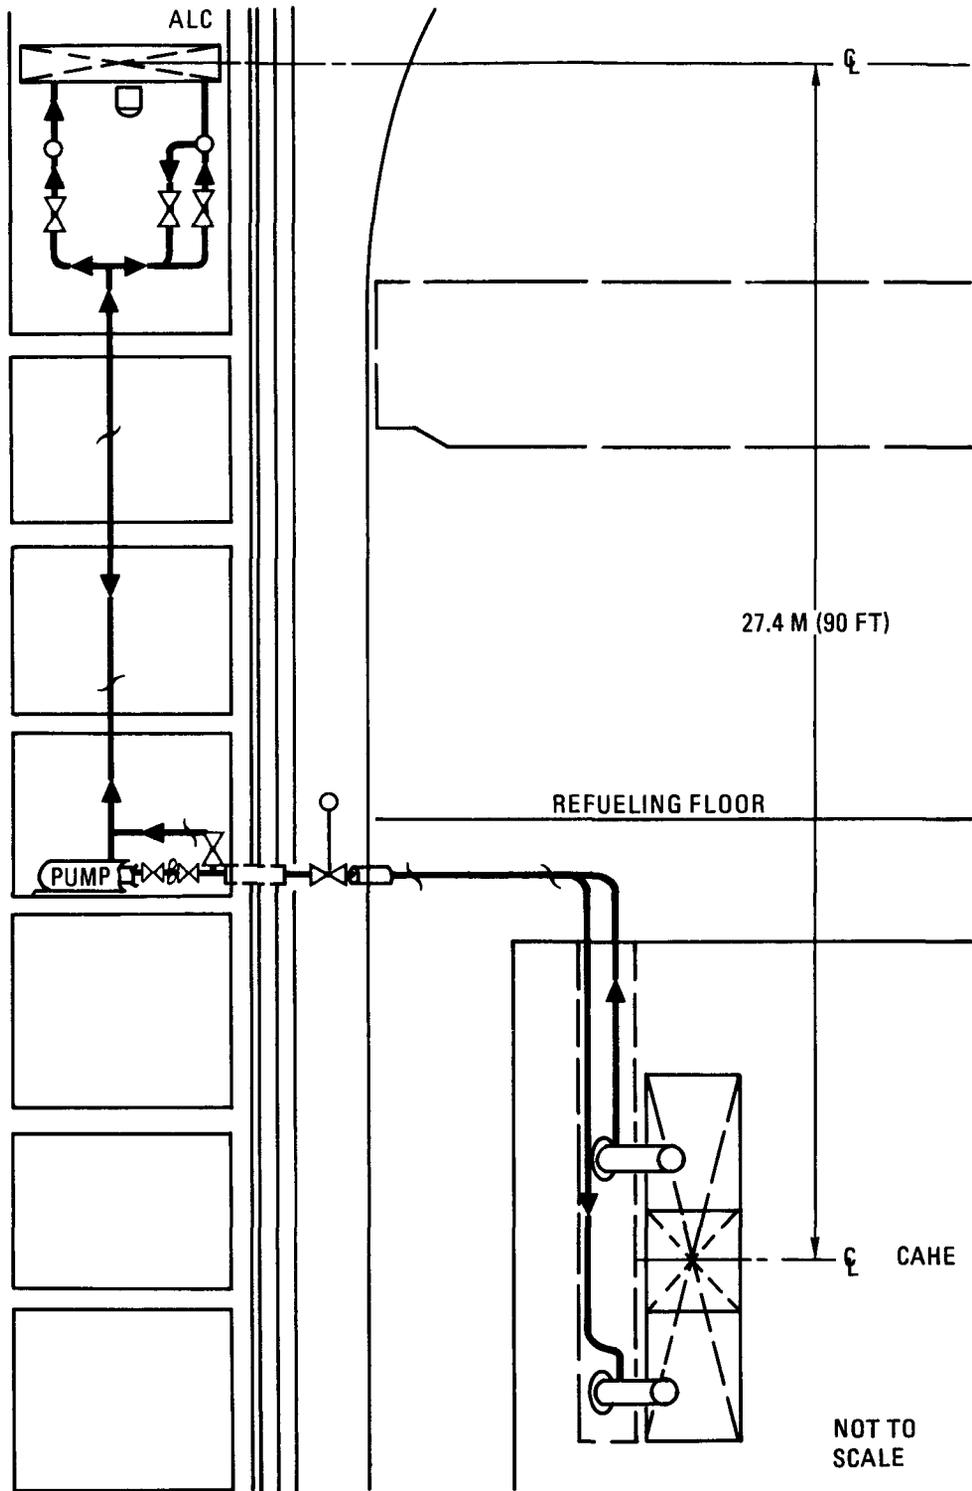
CACWS piping: (a) elevation view (sheet 1 of 2)
